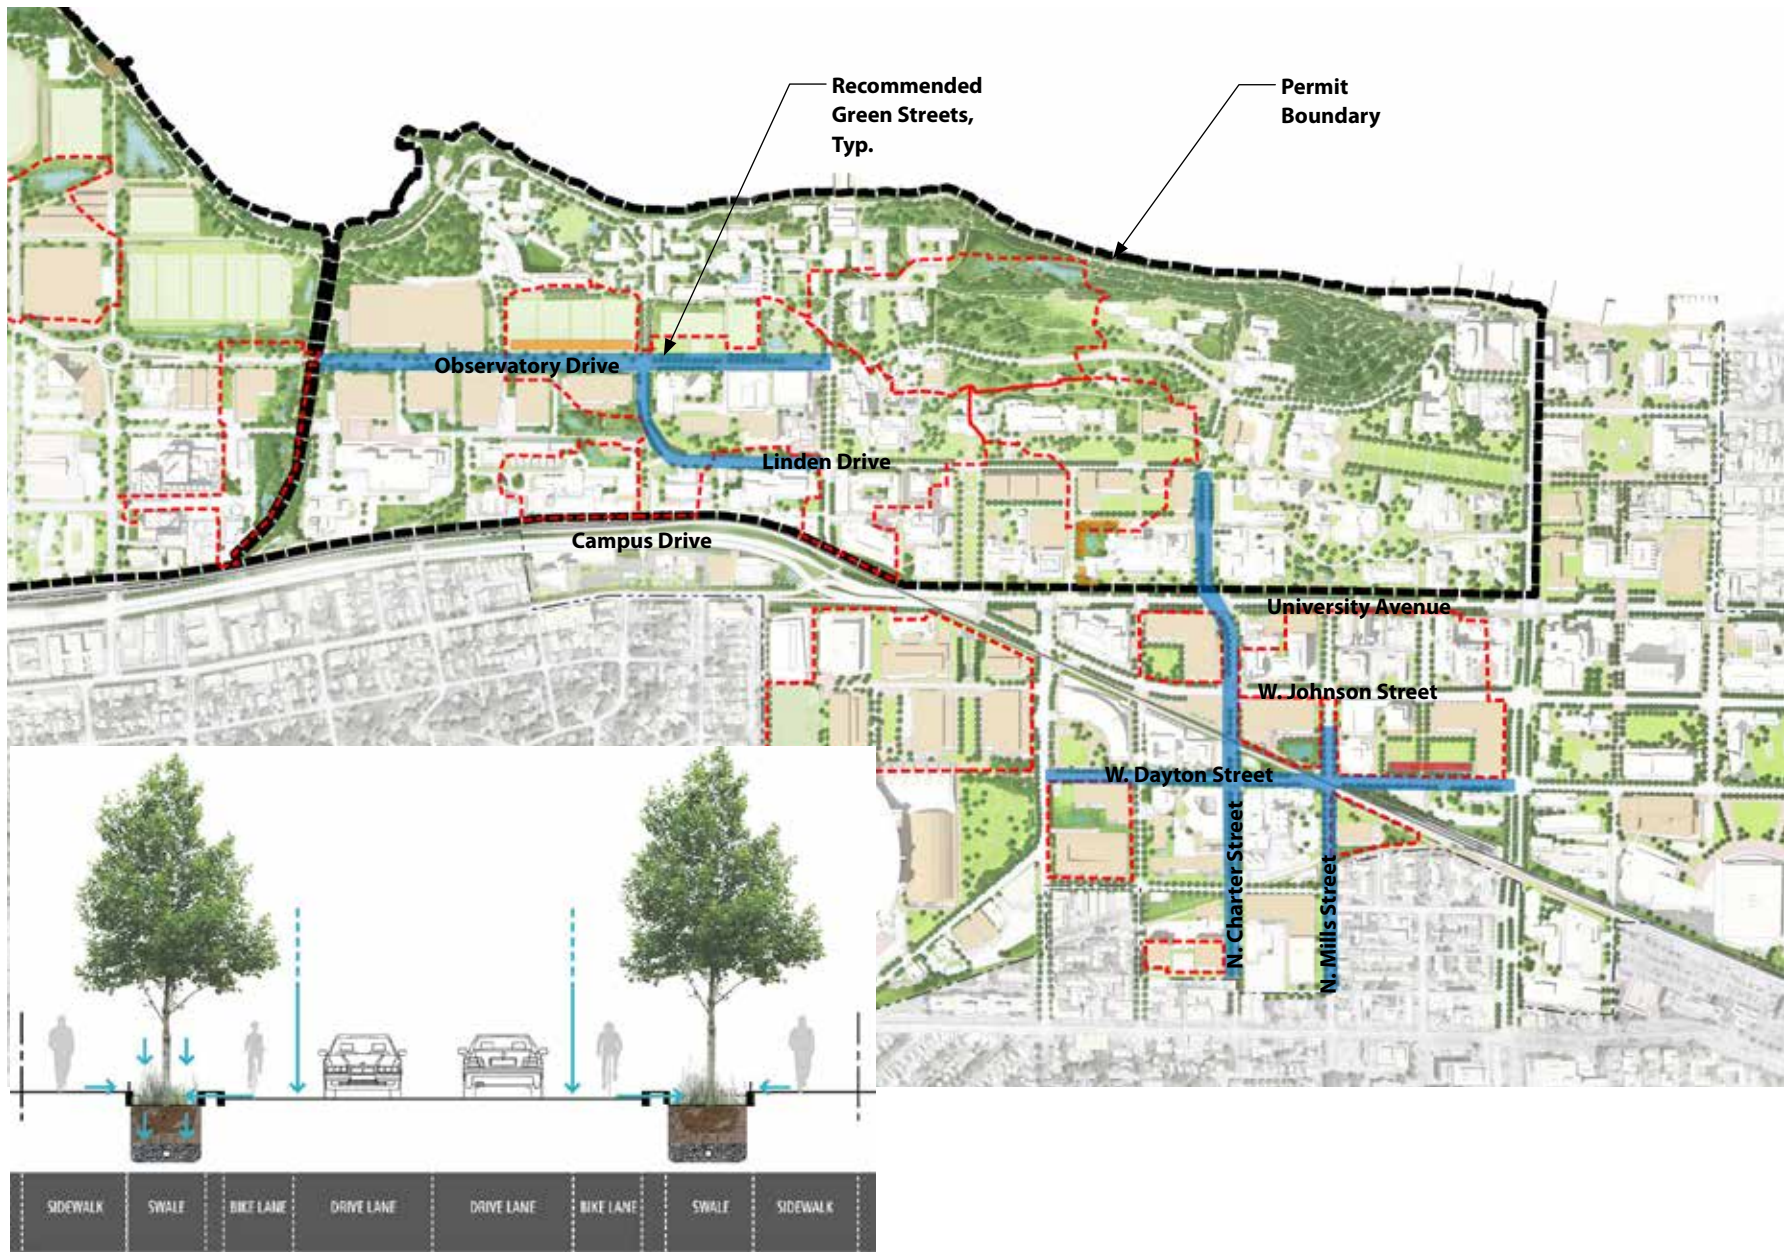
Recommended Green Street Locations & Example Green Street Cross Section
